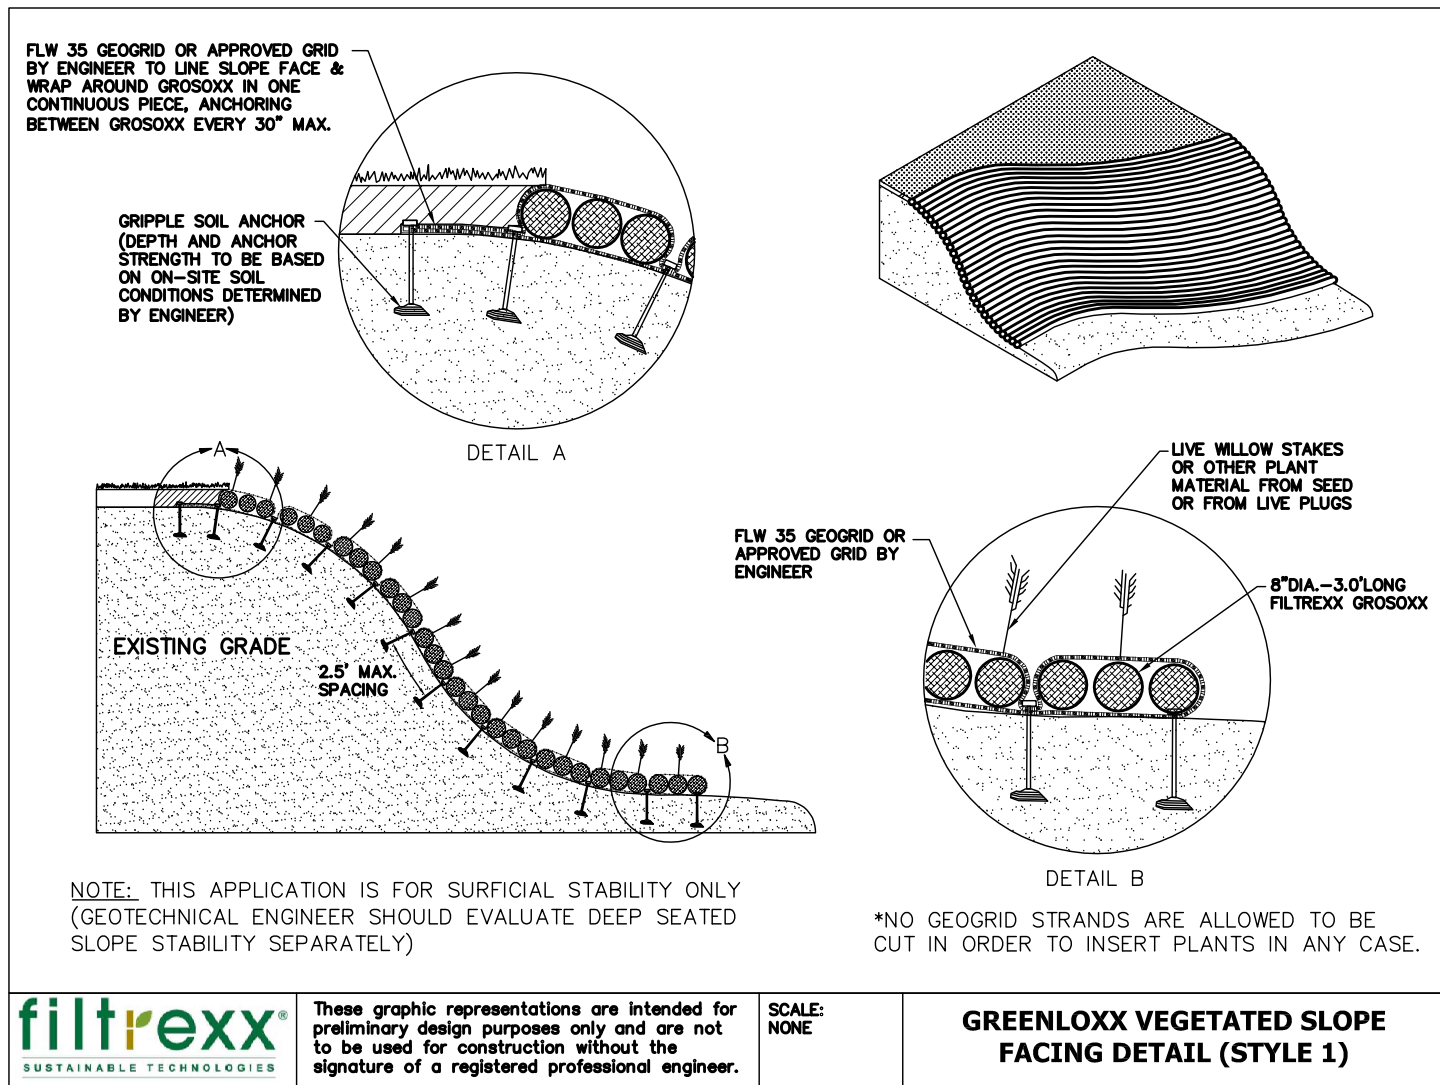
Engineering Design Drawings for Filtrex GreenLoxx® VSF - Alternate Drawing
